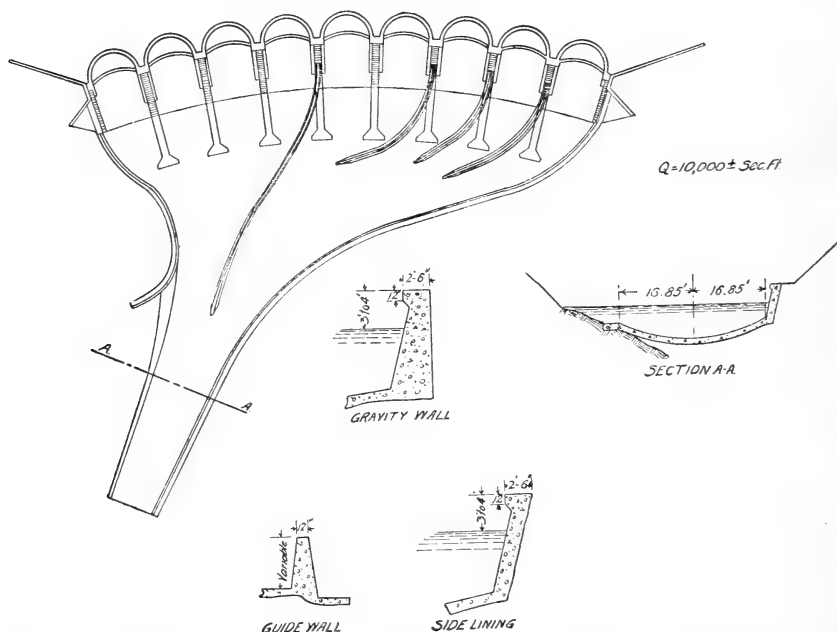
Plan and cross section of East Park reservoir spillway, Orland project, California. Form of dentated type of spillway composed of a series of nine piers, each 8 feet wide.
